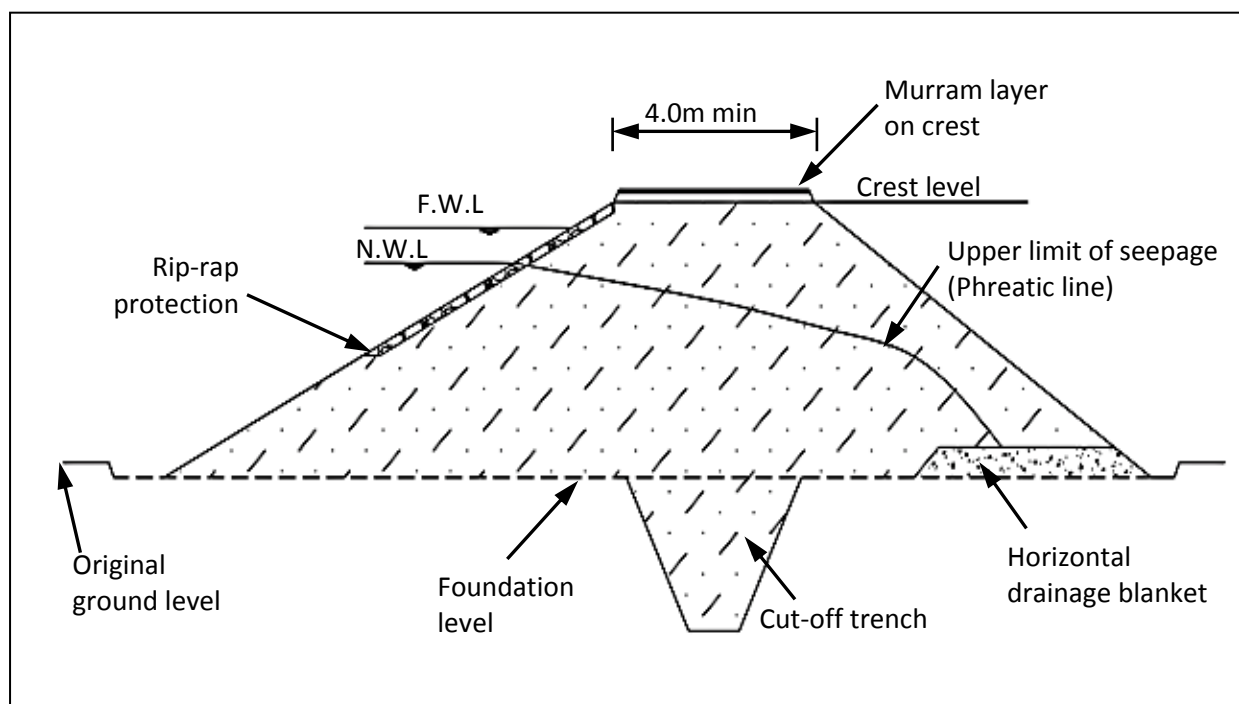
Homogenous Earthfill Dam with Drainage Blanket
